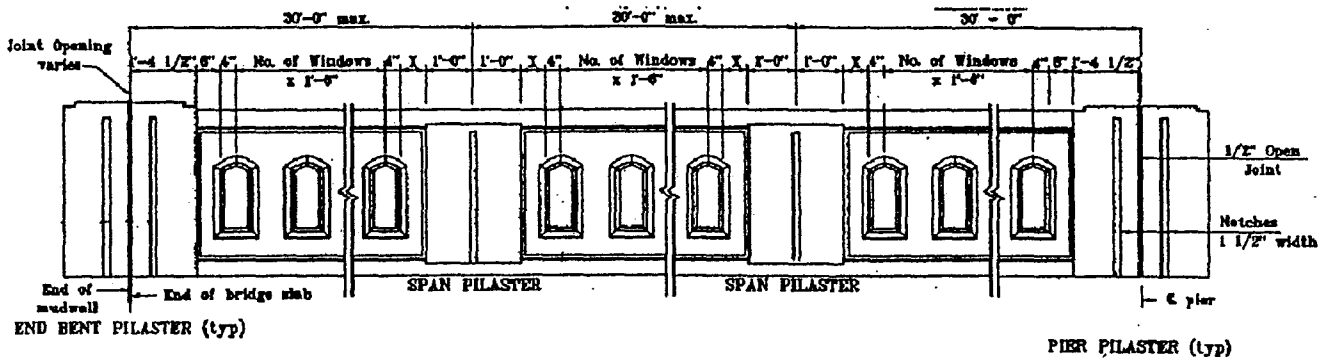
Texas Concrete Traffic Railing (Elevation View)
